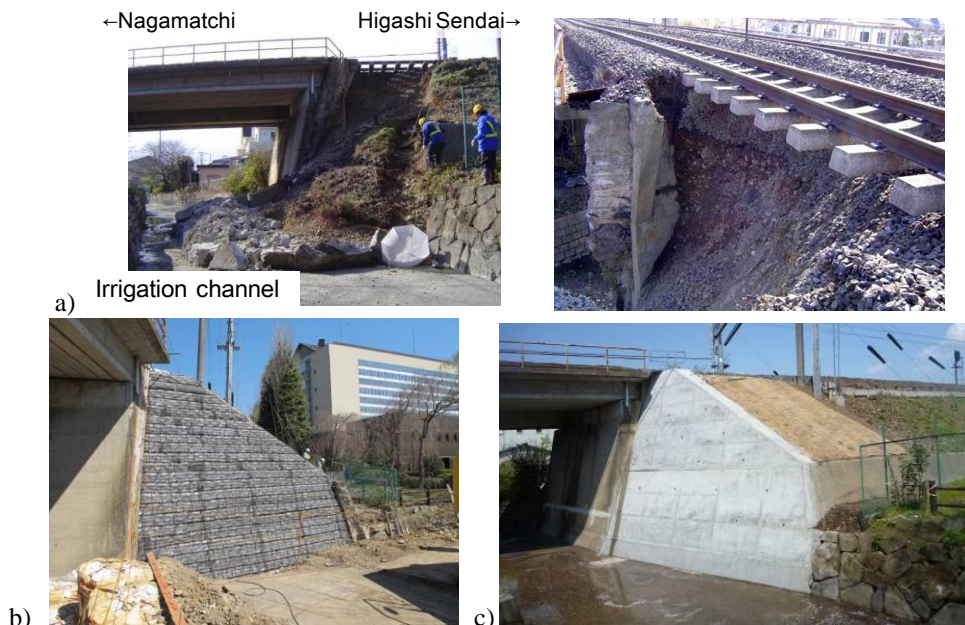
a) Collapse of a wing RW with masonry facing of a bridge abutment (Nagamachi, Sendai for Tohoku Freight line); and b) & c) restoration to a GRS RW (by the courtesy of the East Japan Railway Co.).
